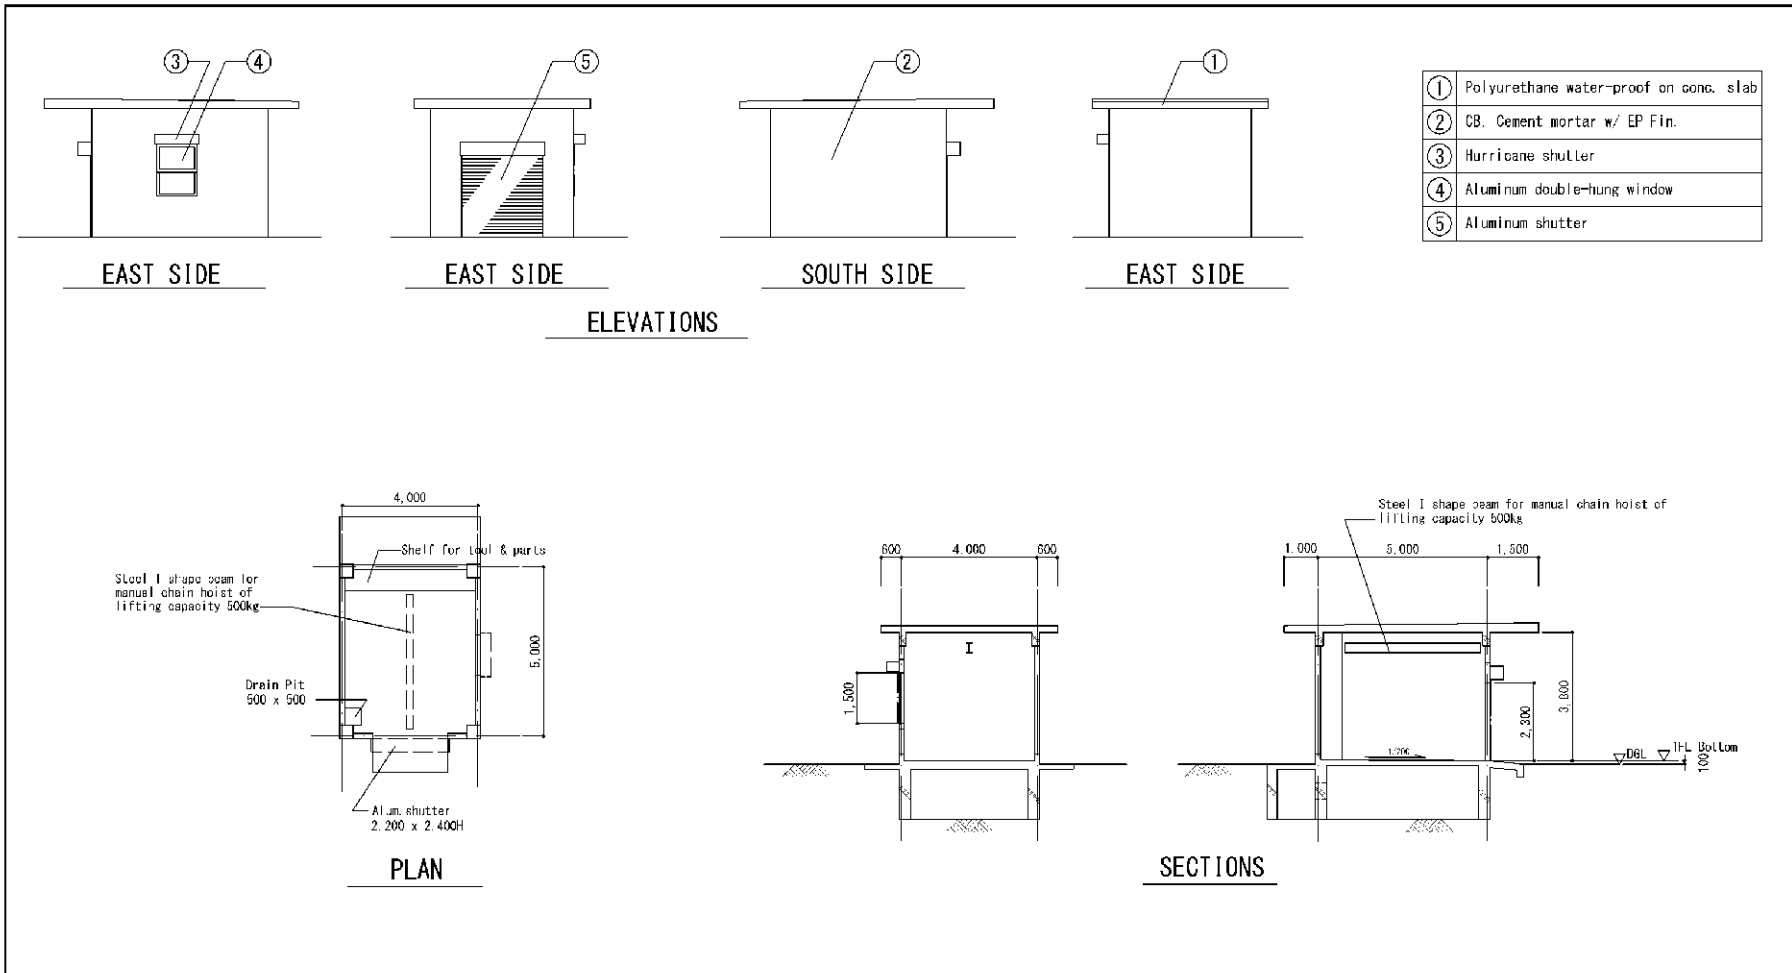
(11) Work Shop (Plan, View and Cross Section)
